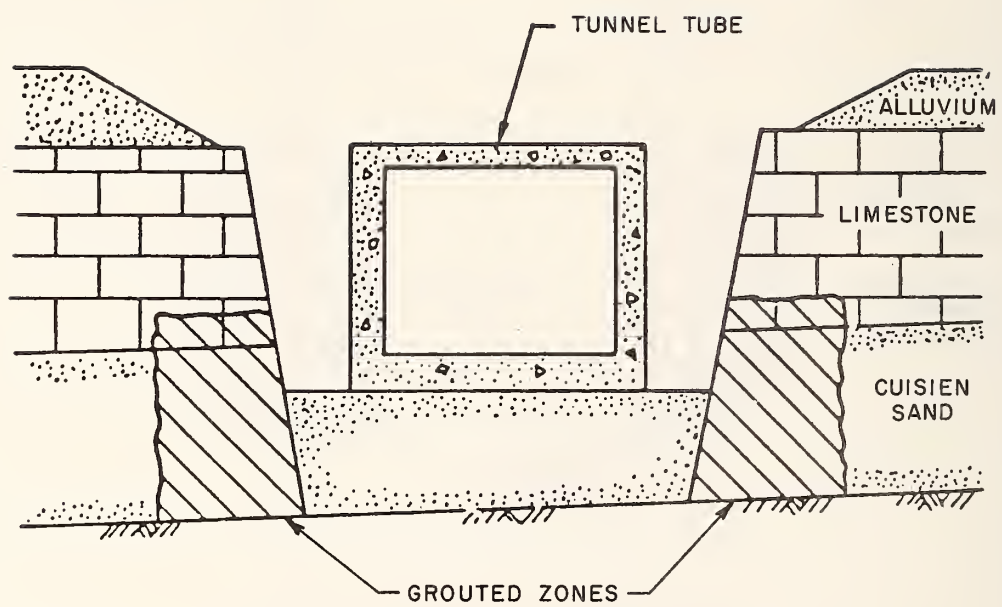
Grouting of Cuisien Sand in Tunnel Tube Bed, Paris Metro (Ref. 72)
